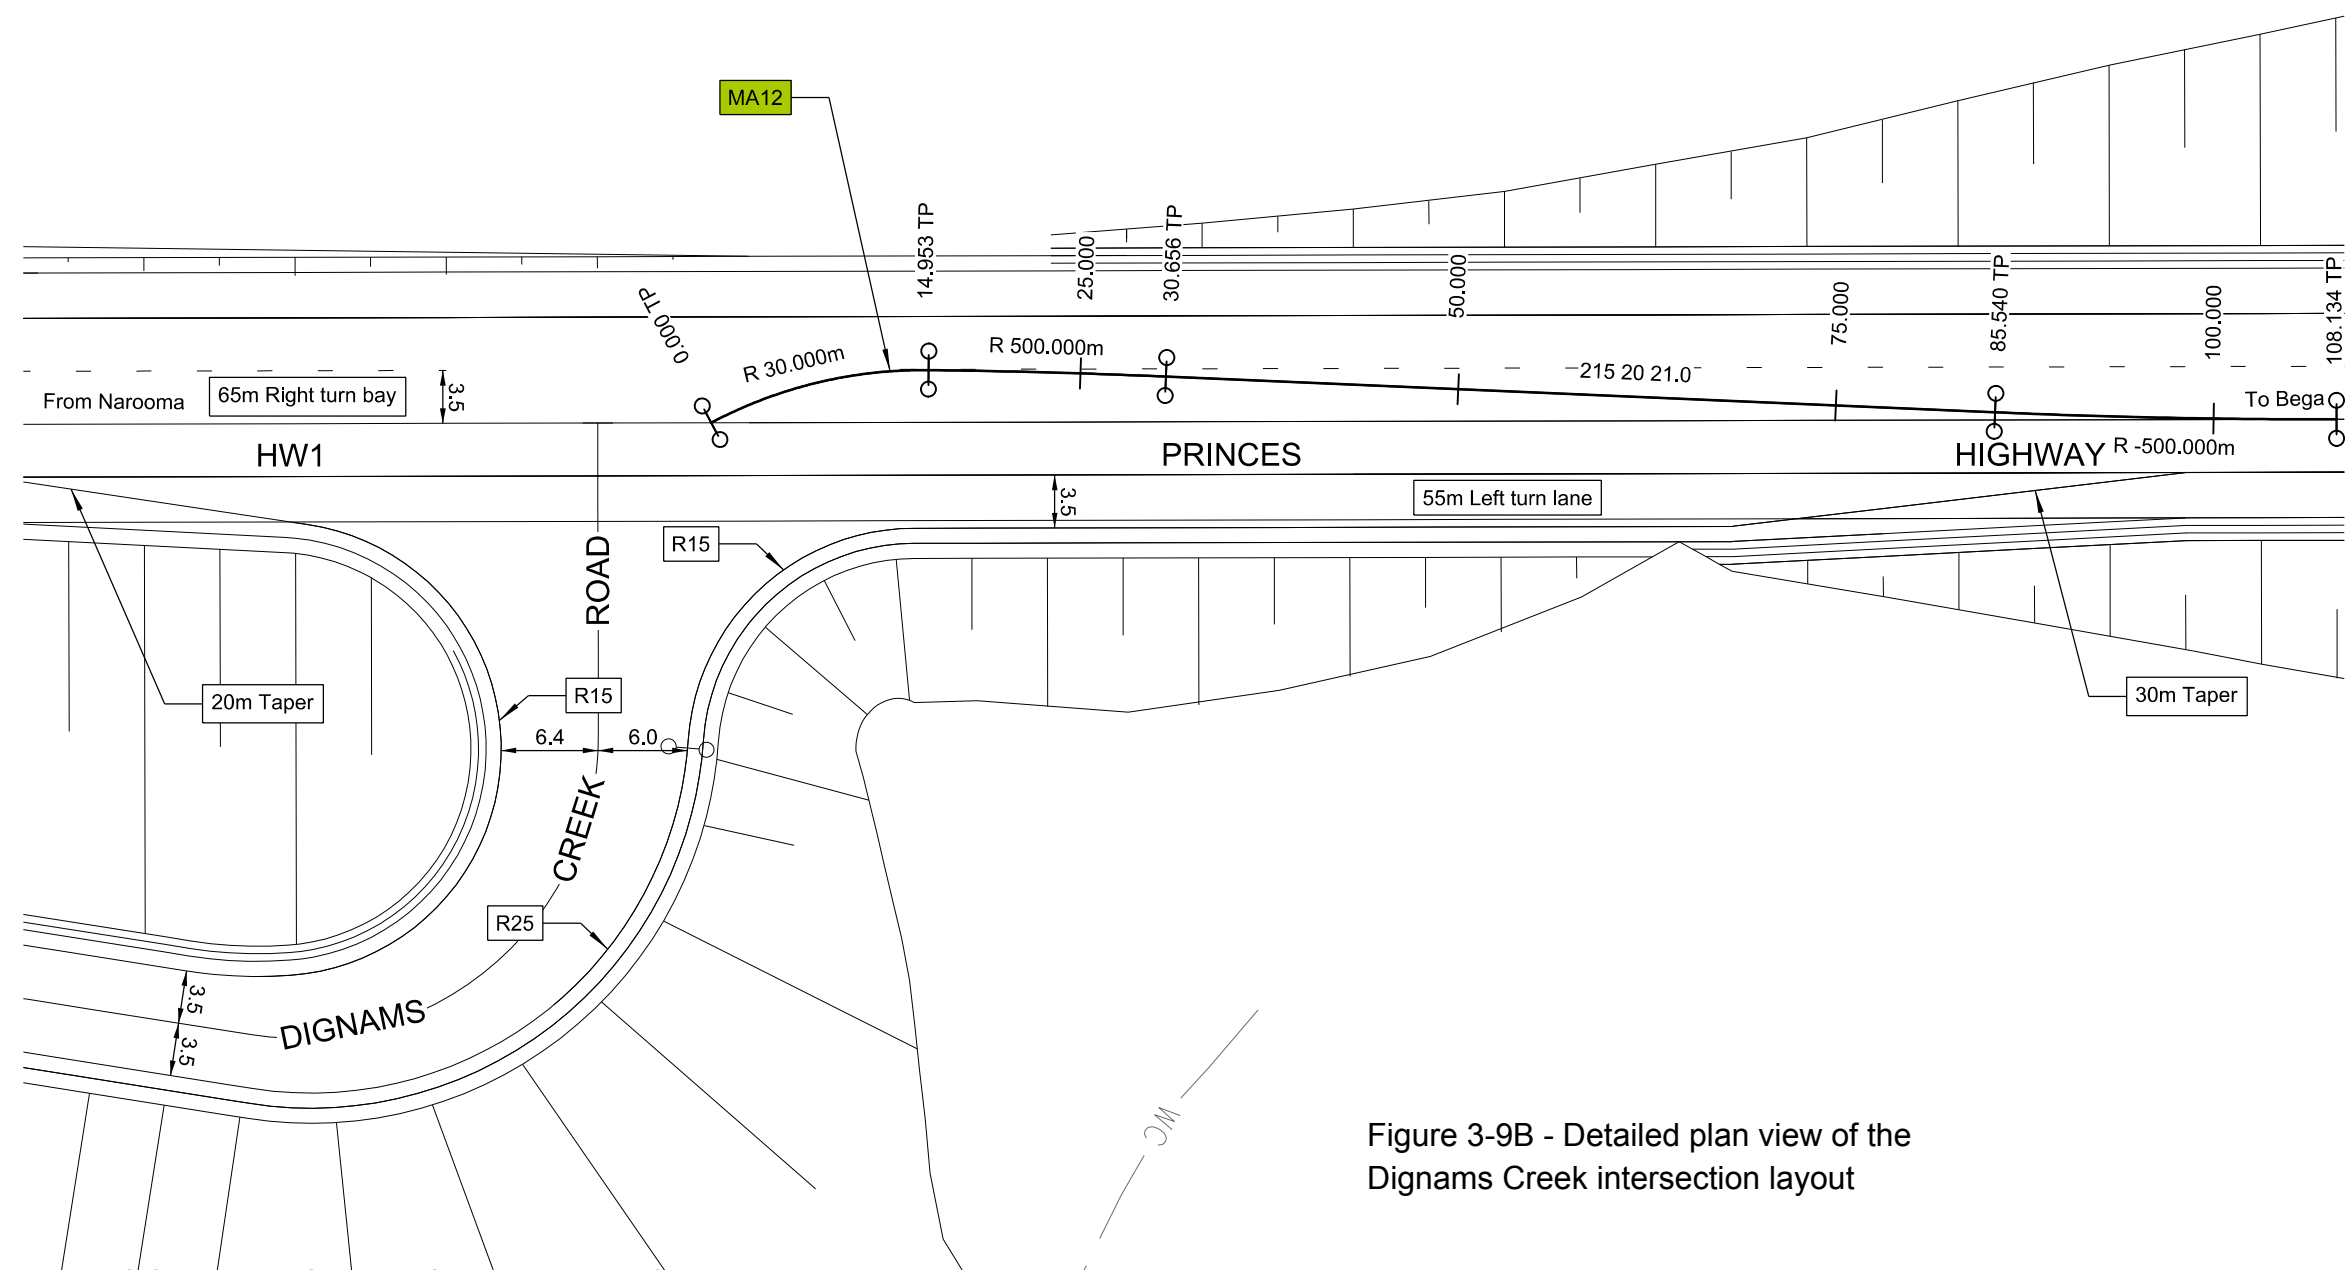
B - Detailed plan view of the Dignams Creek intersection layout
